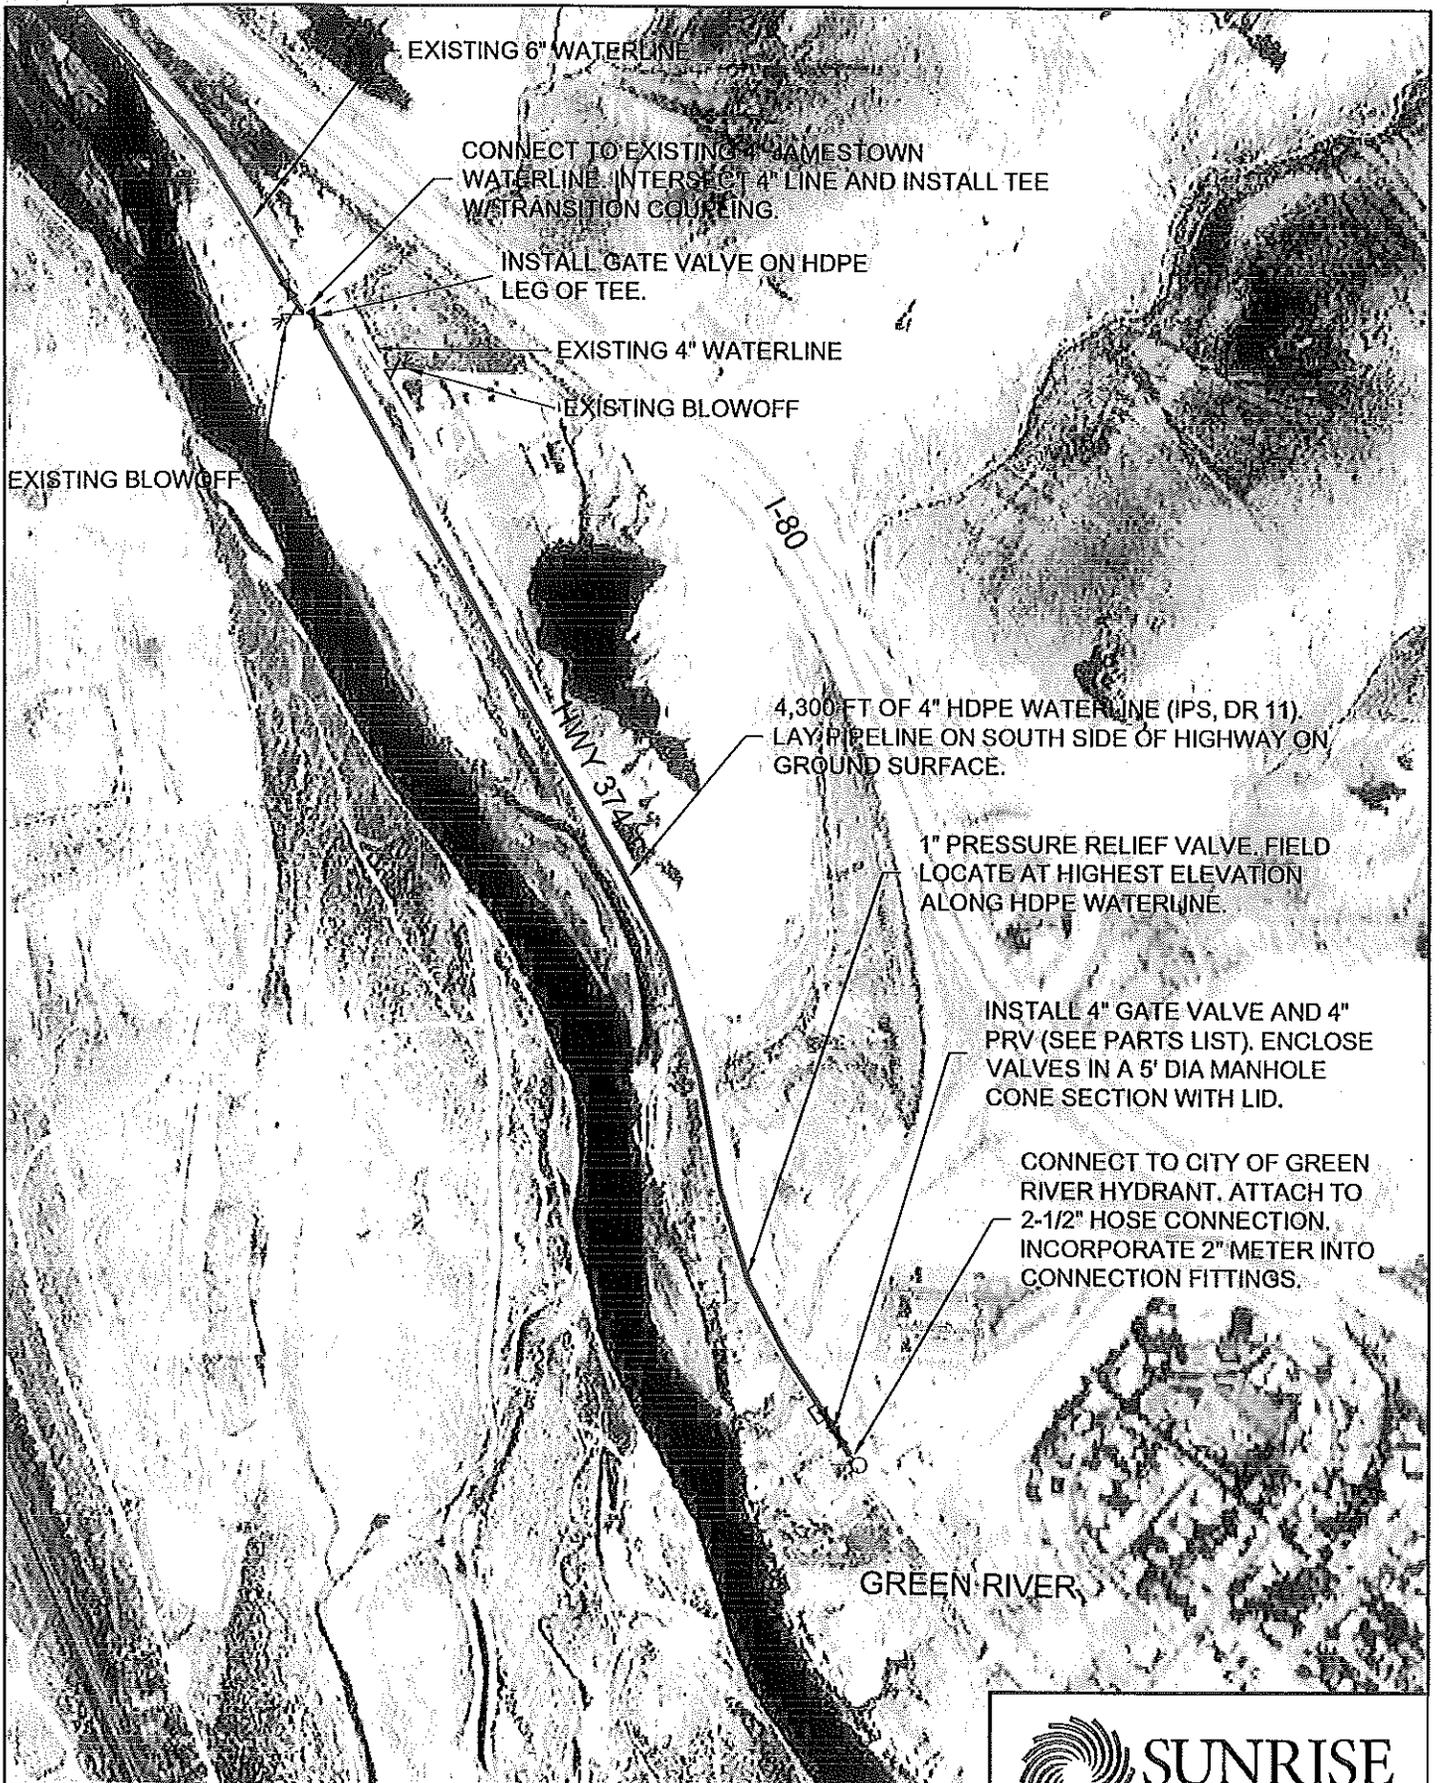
Jamestown/Rio Vista Water and Sewer District
